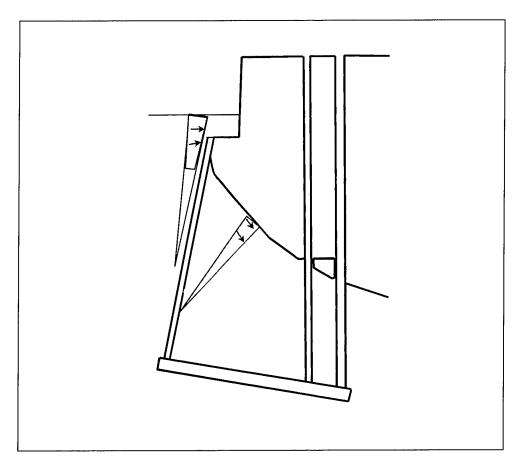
Cross section of a turbine intake at MU 1 showing typical deployment of up-looking hydroacoustic beams for sampling fish passing into the sluiceway (left) and turbine (right)
